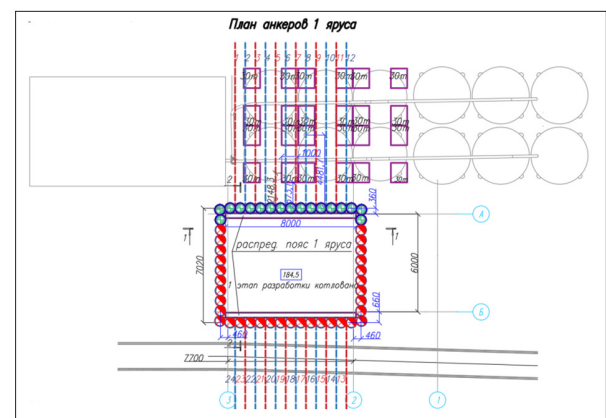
Plan of arrangement of buried retaining structures of the construction pit
